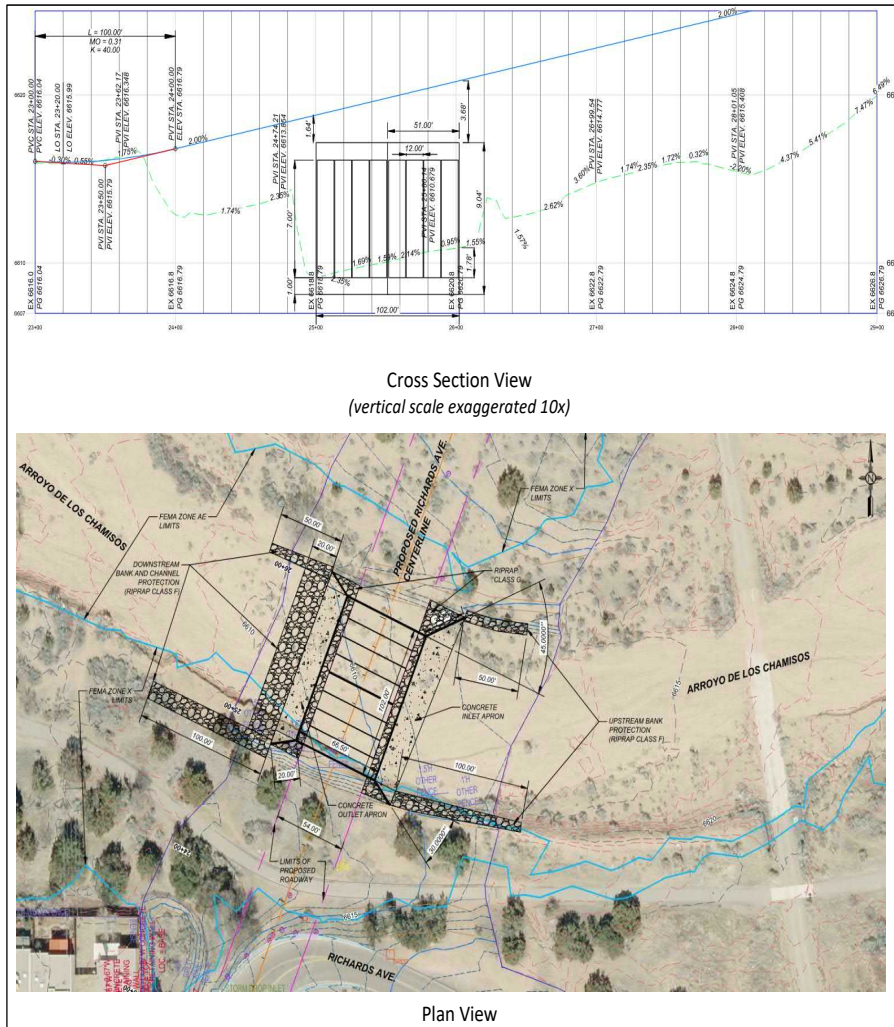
, Concrete Box Culvert Concept for Arroyo de los Chamisos
